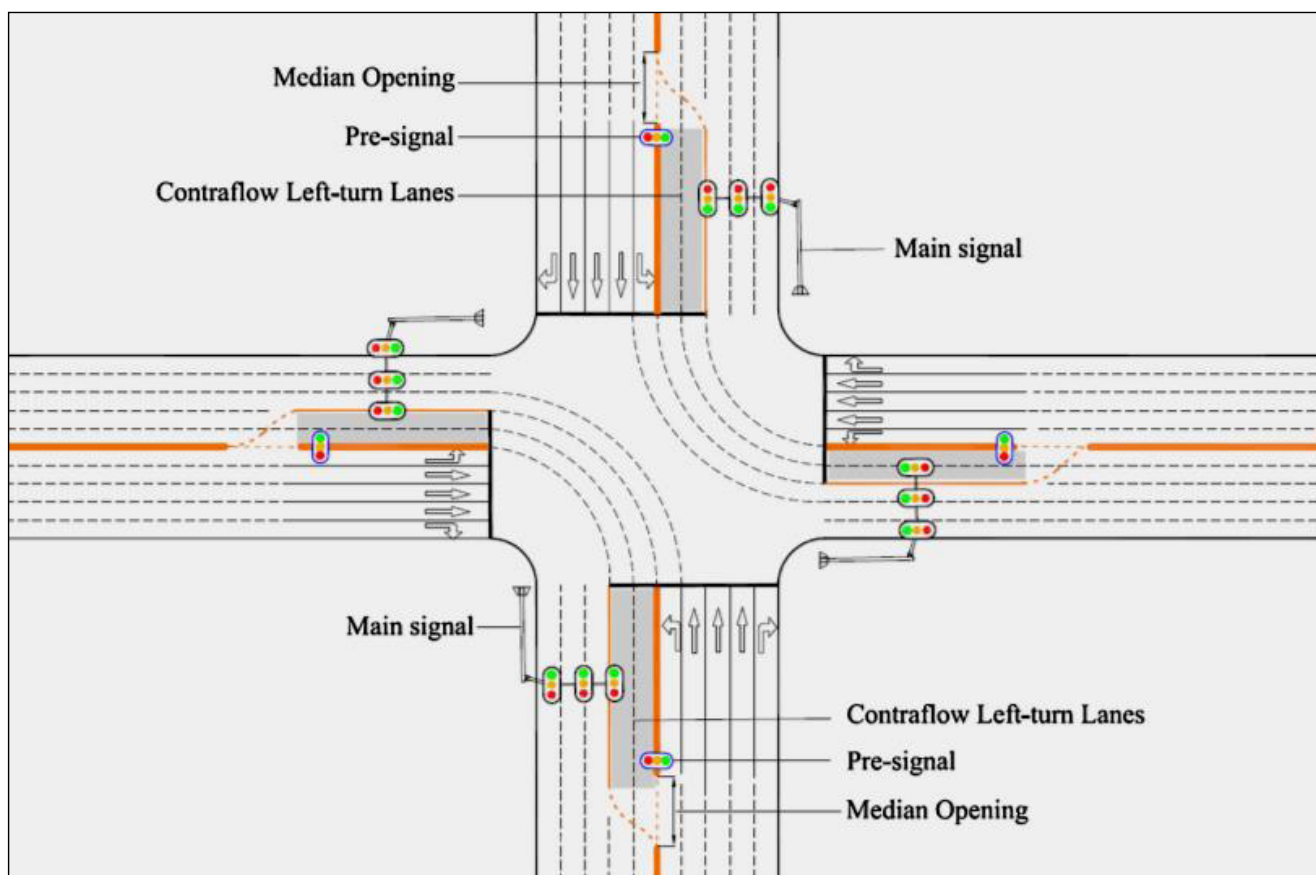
Detailed Layout of CLL Design at Signalised Intersection (Wu et al., 2016)
